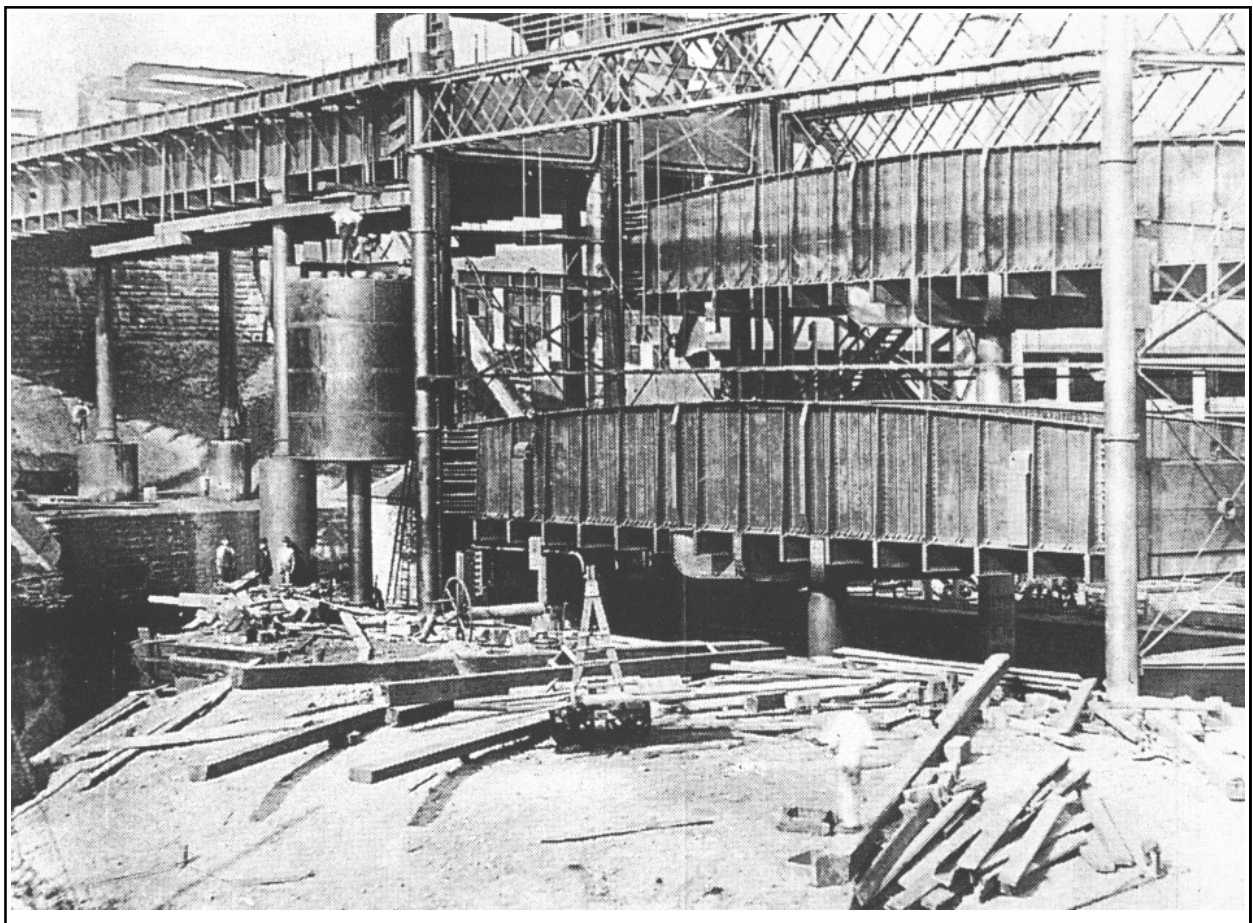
Anderton Hydraulic Lift under construction²⁰
